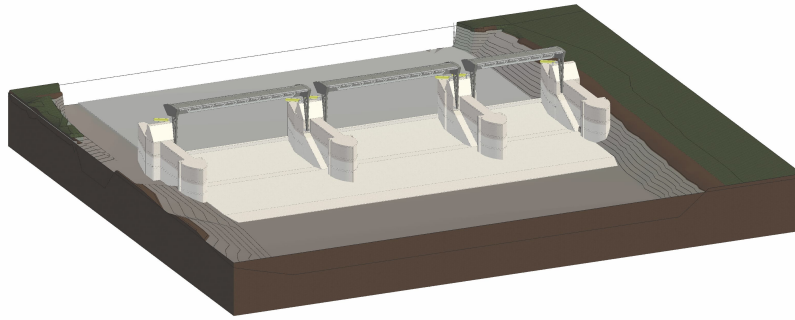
Preliminary layout of navigable weir, open weir with lifted segment gates (looking downstream).
